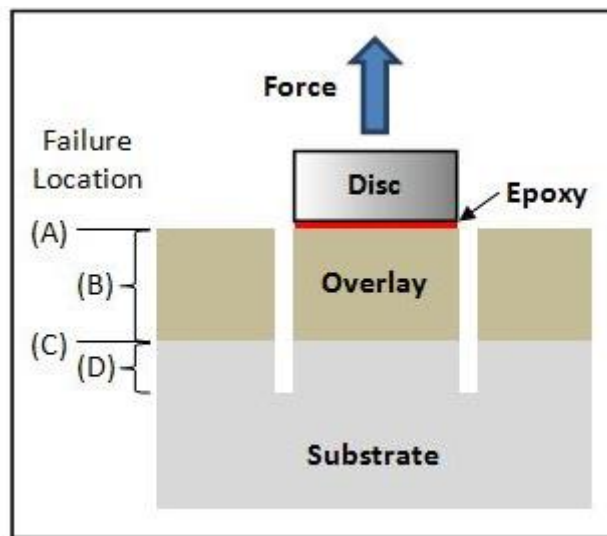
Concrete Pull-Off Testing Schematic and Failure Planes
